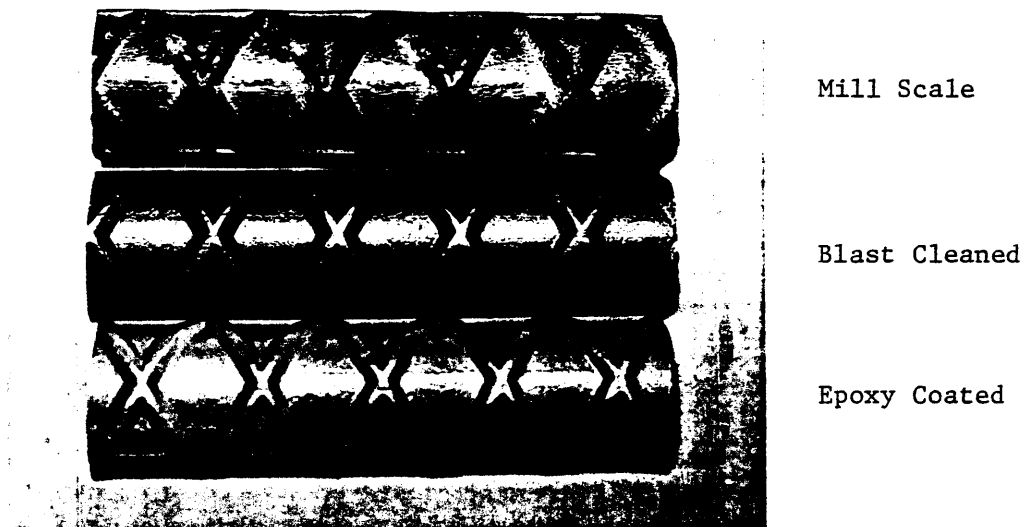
Surface Condition of No. 11 Reinforcing Bars
